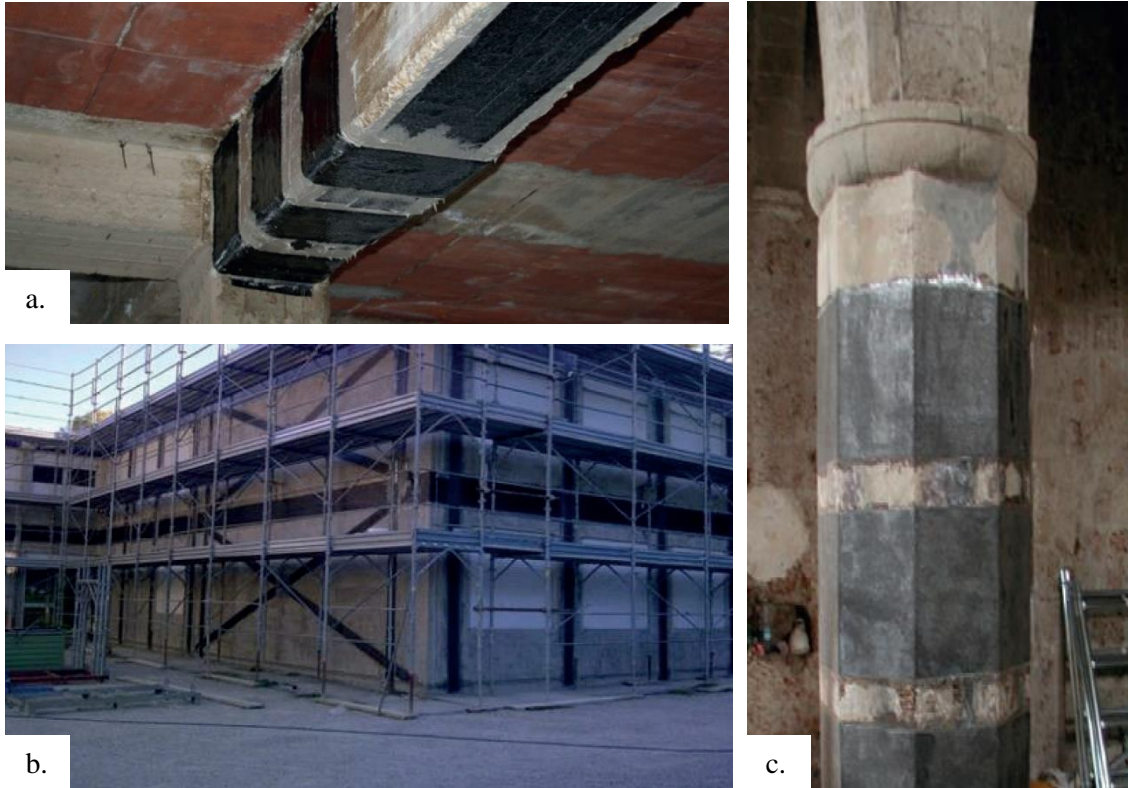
Application of FRP composites: a) Flexural and shear strengthening of a concrete beam; b) Strengthening of a masonry wall to prevent local mechanisms; c) Confinement of a column [3].
